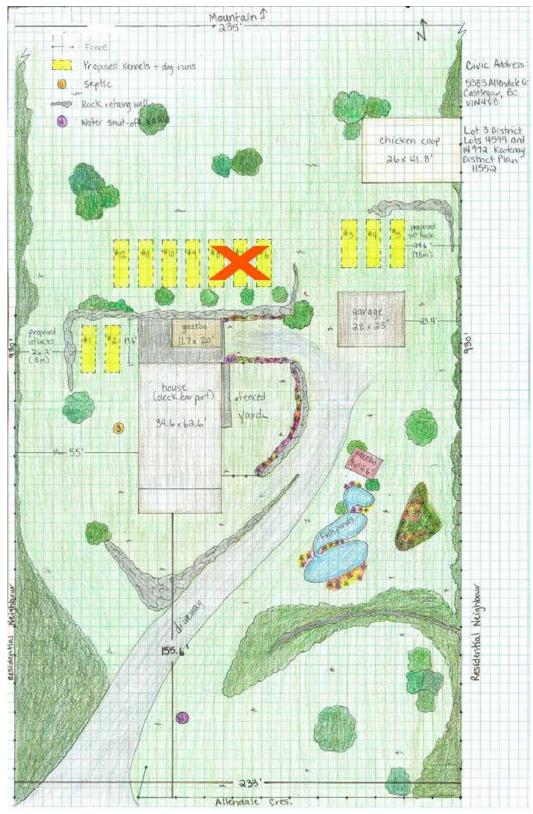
Site Plan showing the location of the proposed kennel structures. Note that kennel structures #6-8 are no longer being propose.
